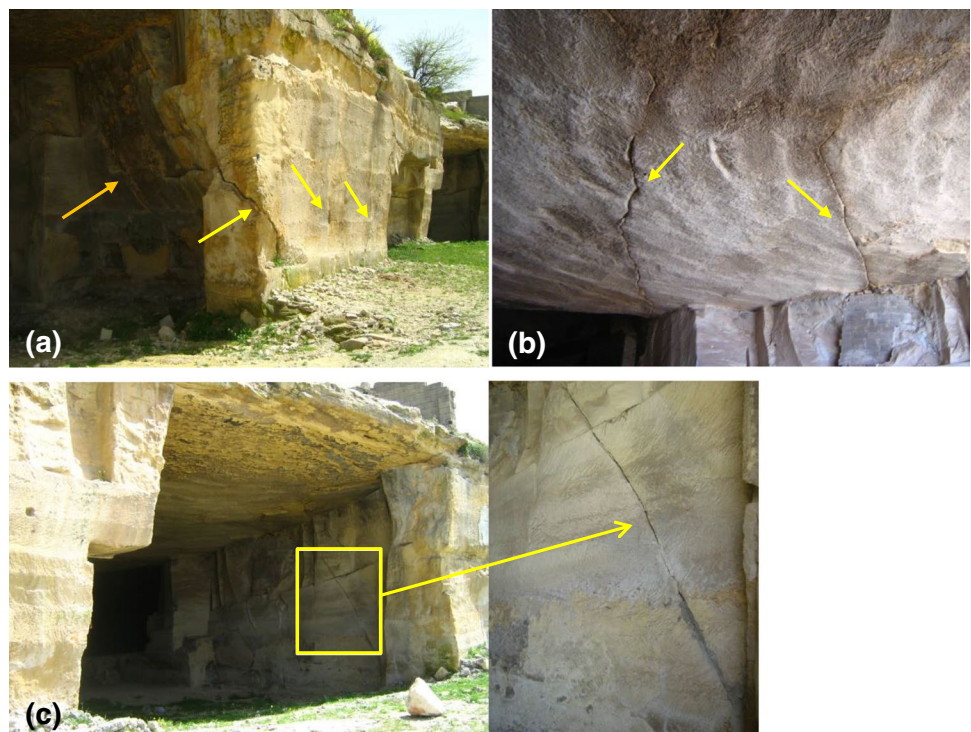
Some examples of the cracks developed in the pillars and roof. a The outside pillar of opening 2, b the roof of opening 3, c the pillars between openings 3 and 4
